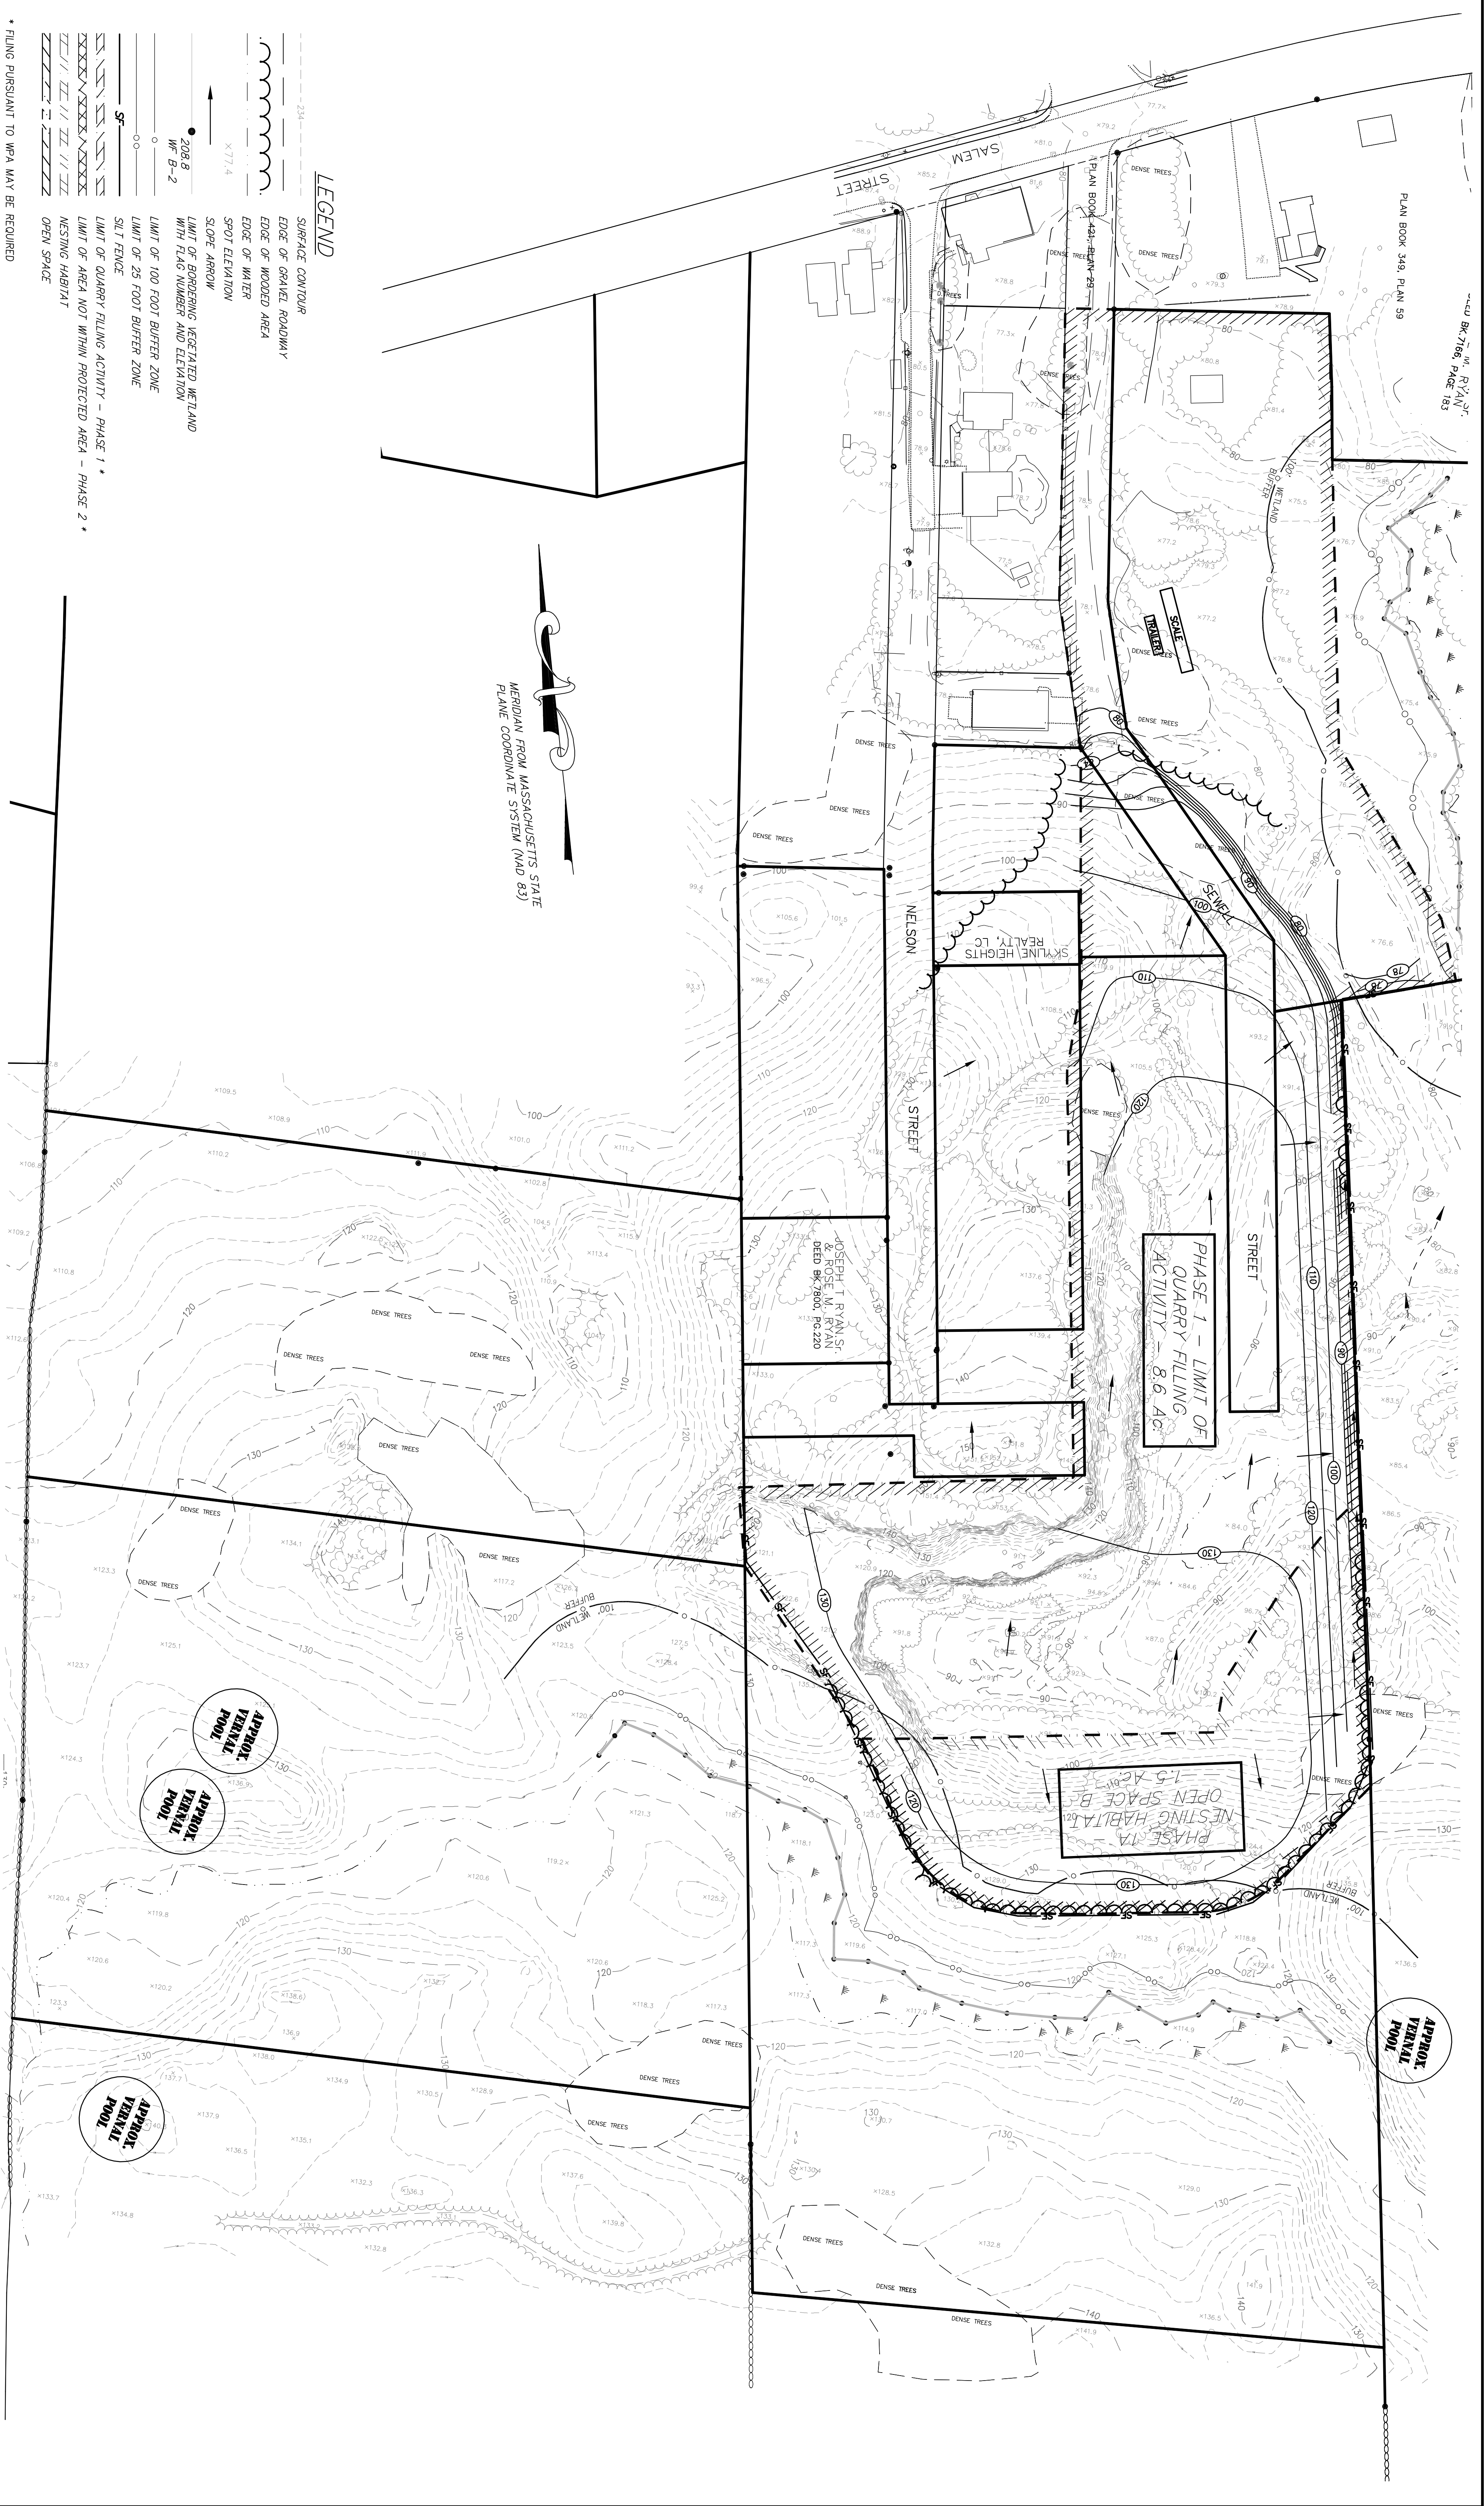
NHESP APPROVED SITE DIVISION 2017 DRONE IMAGERY SEWELL STREET QUARRY
